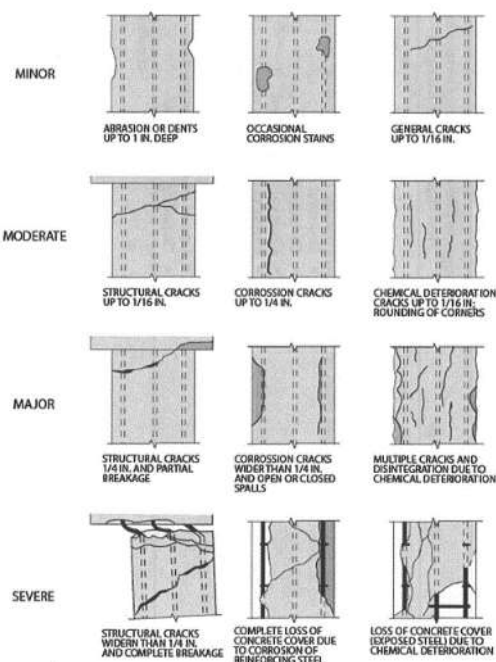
Damage ratings for reinforced concrete elements
